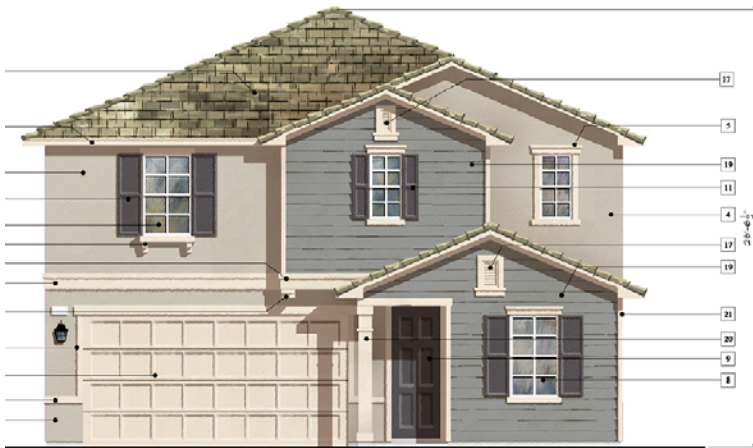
Exhibit B — FLOOR PLANS AND ELEVATIONS: PLAN 4
